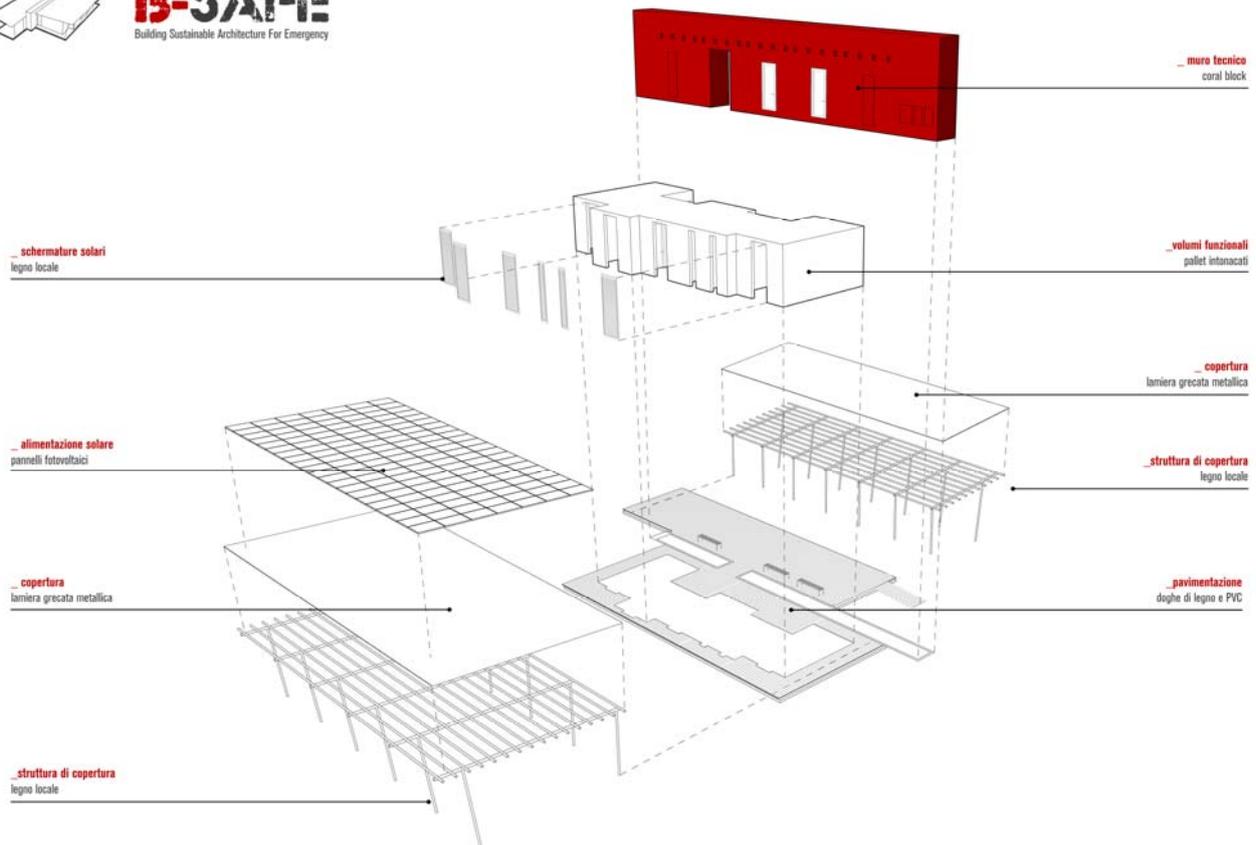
Structural schemes showing use of dry construction assembled by pallets.
